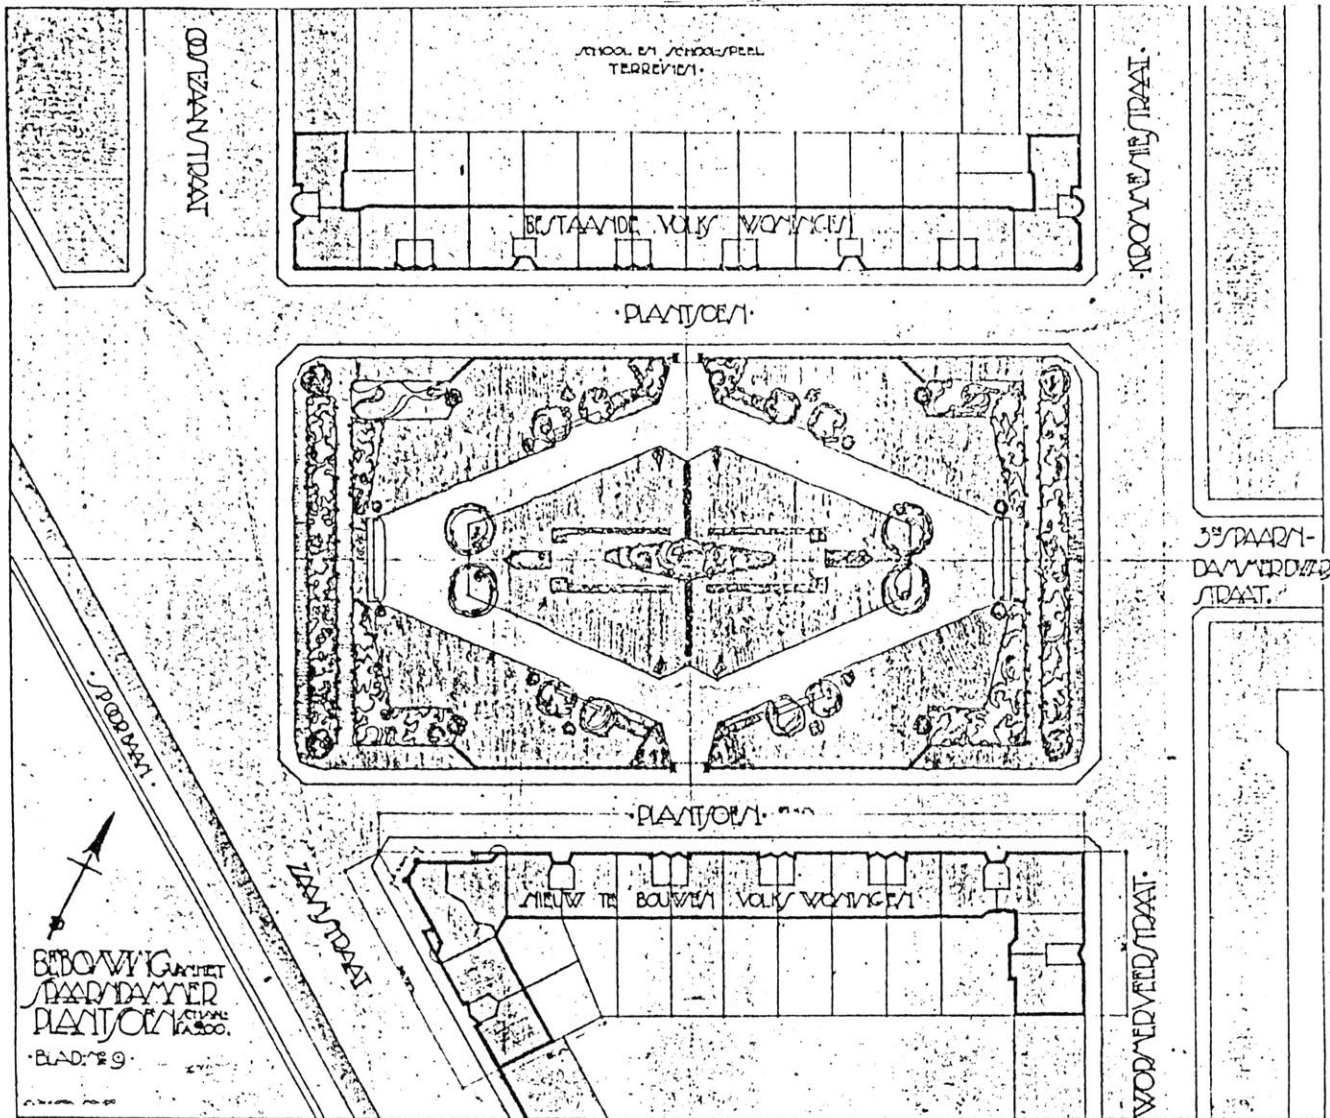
Site plan, Spaarndammerplantsoen, M. de Klerk
